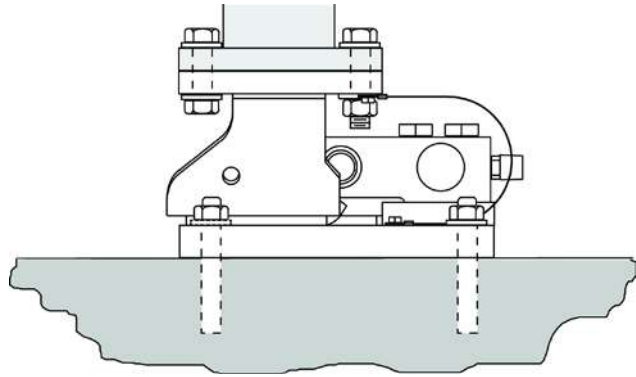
Base Plate Bolted to Level Concrete Floor
